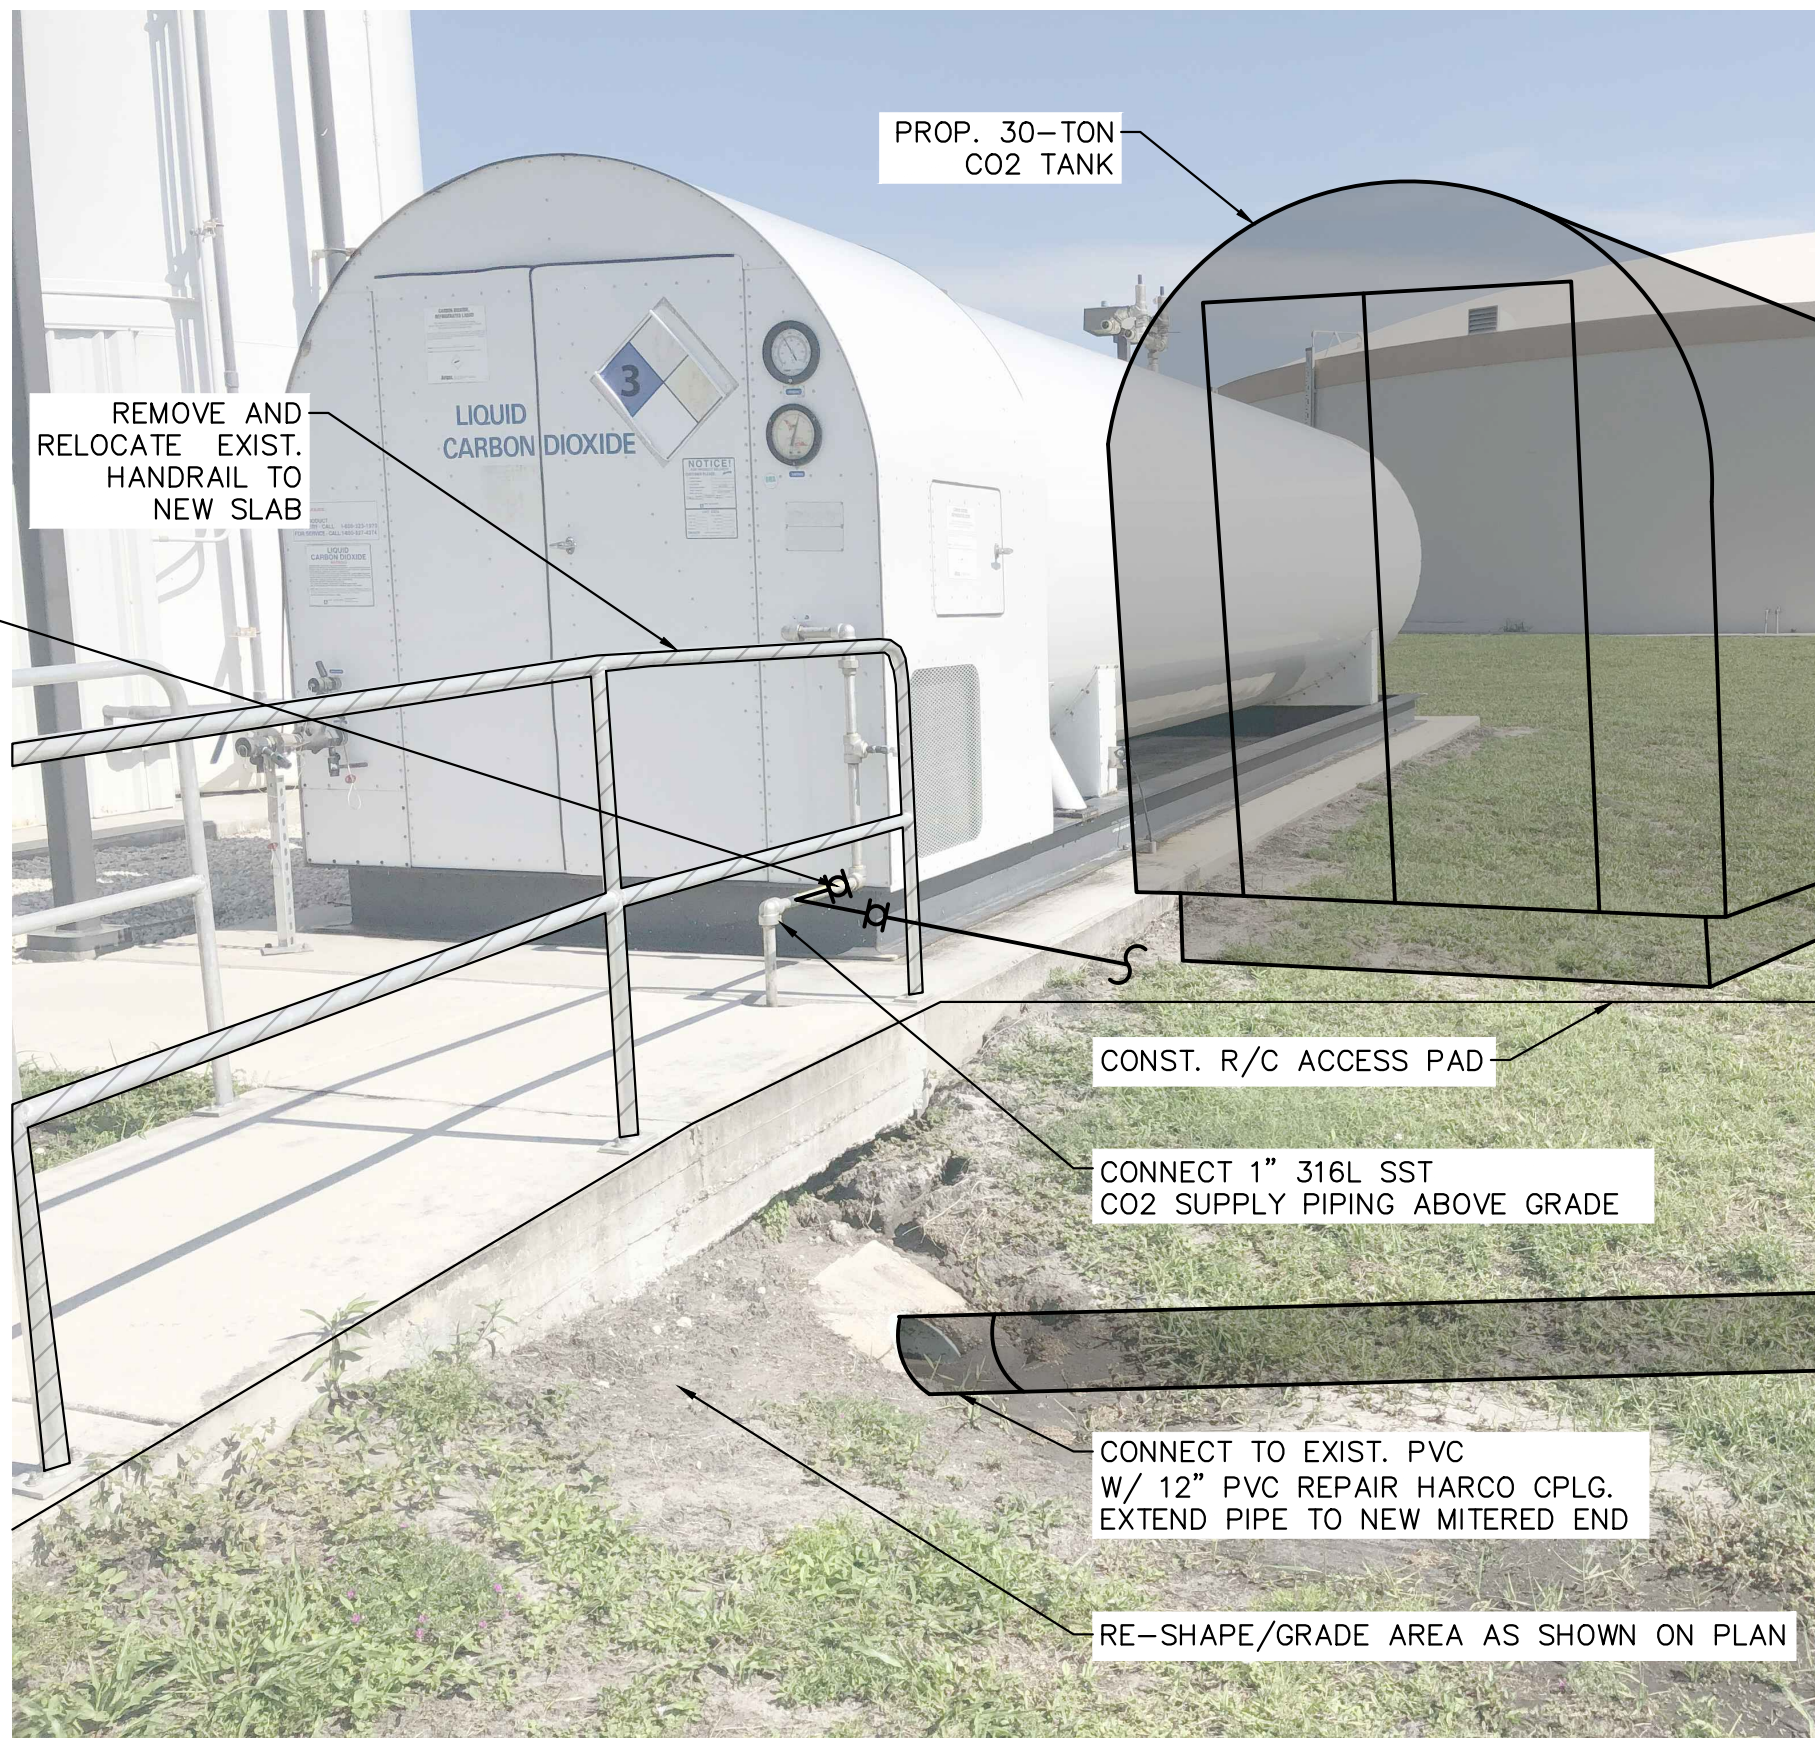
EXIST. CO2 TANK AND MITERED END DRAIN PIPE N.T.S. ★
